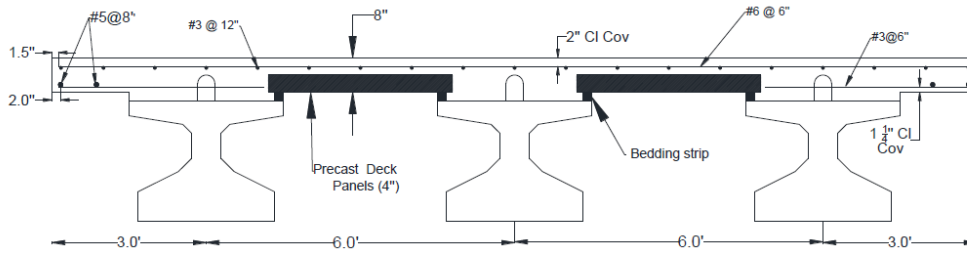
Deck Reinforcement and Girder Spacing (Beneberu, 2016)
